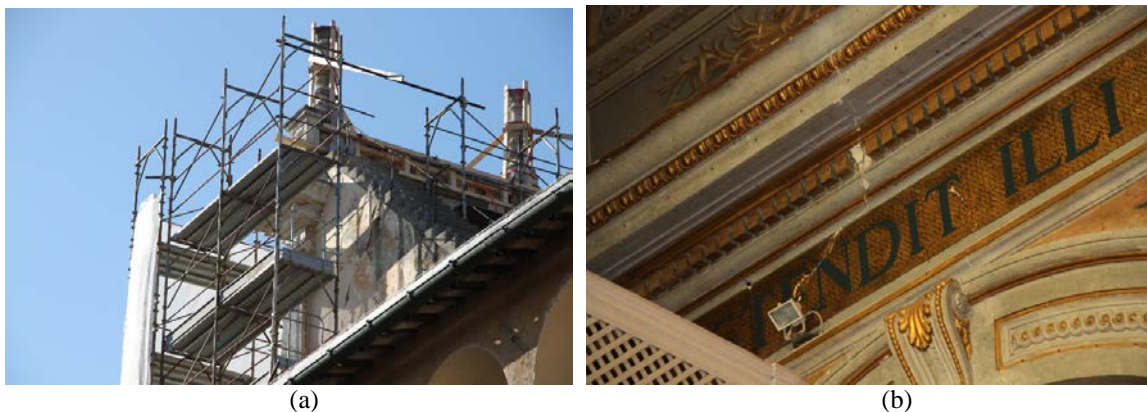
(a) Crack opened on the buttress of the façade; (b) Cracks on the nave wall near the façade
